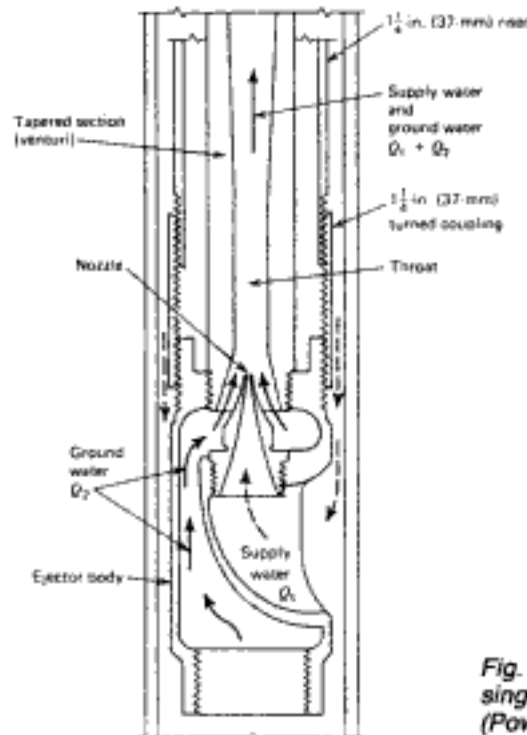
Cross-section of single pipe ejector (Powers³)
